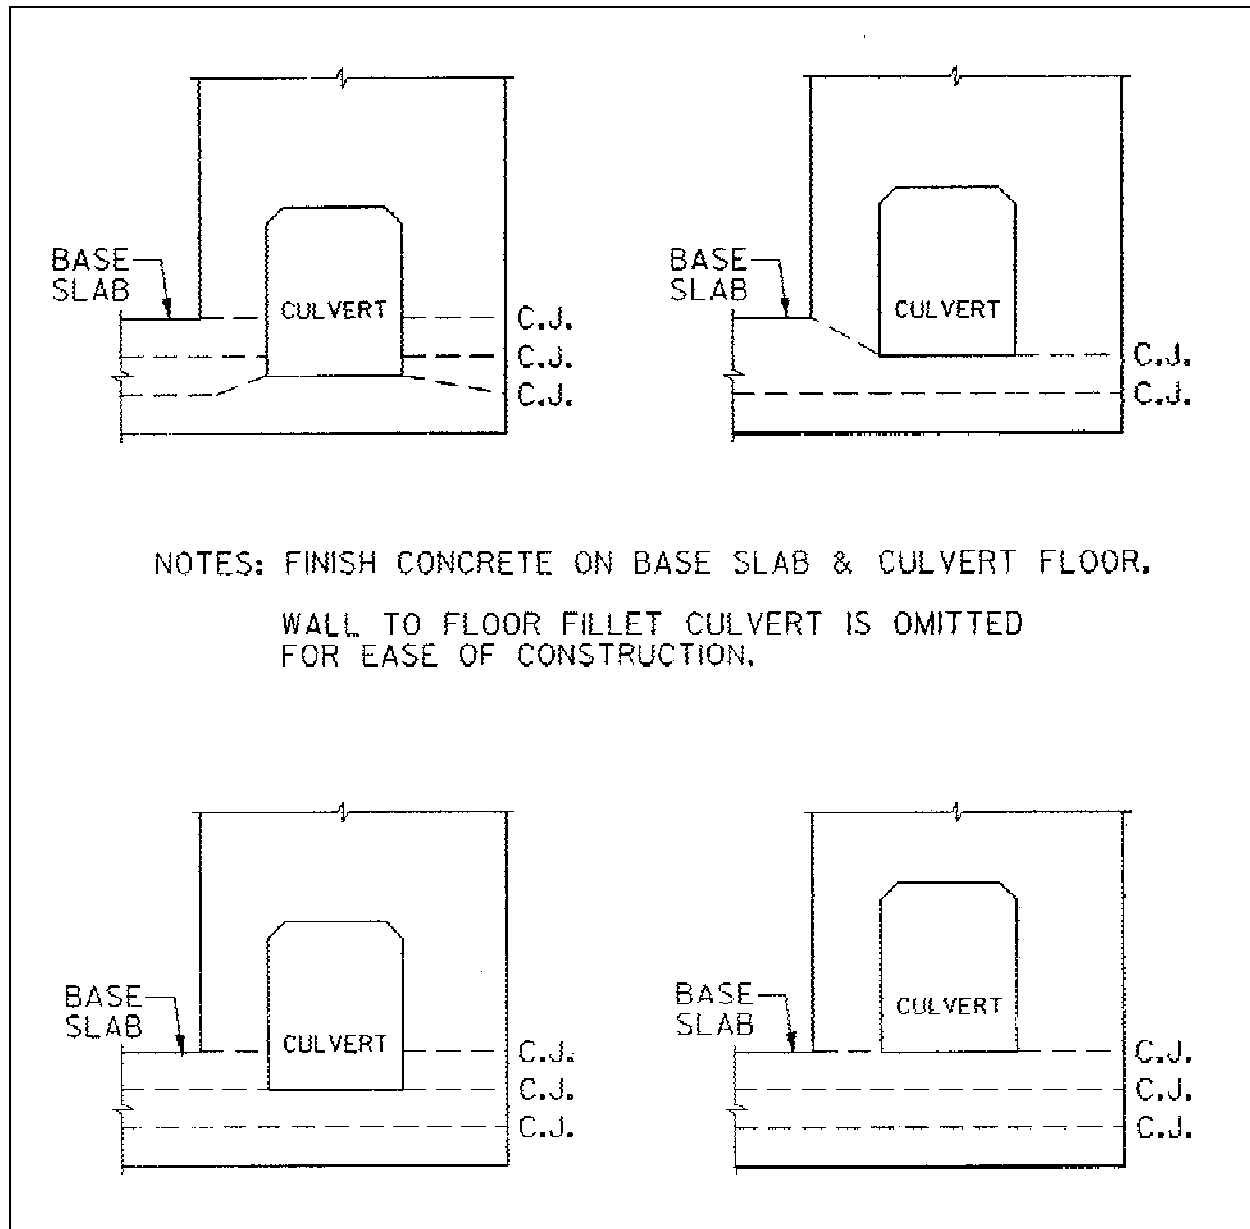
Varying elevations of construction joints and concrete finish floor elevations
